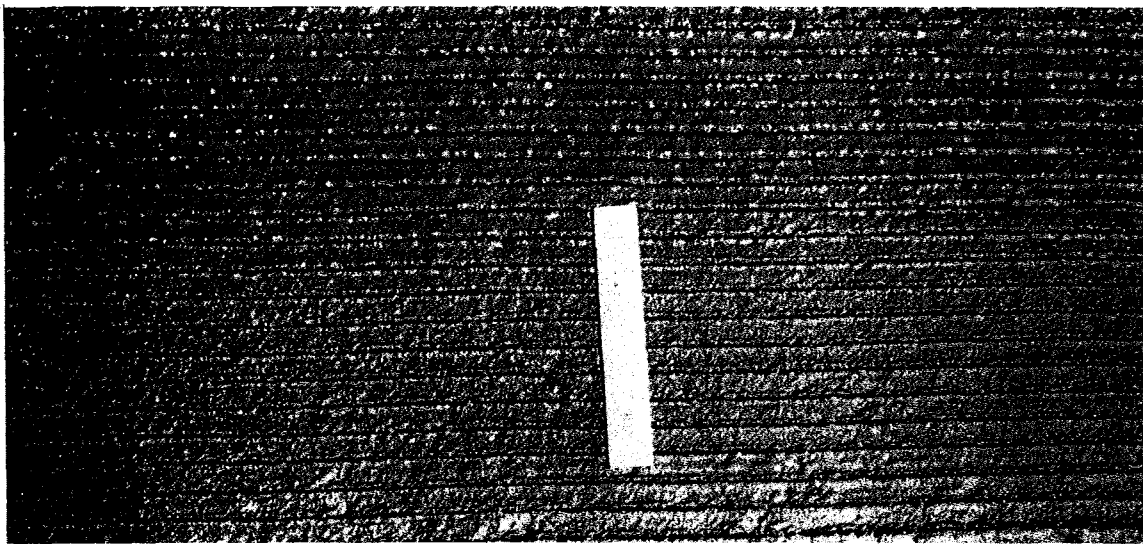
Test Section F-14: Burlap + 3/4 in.
